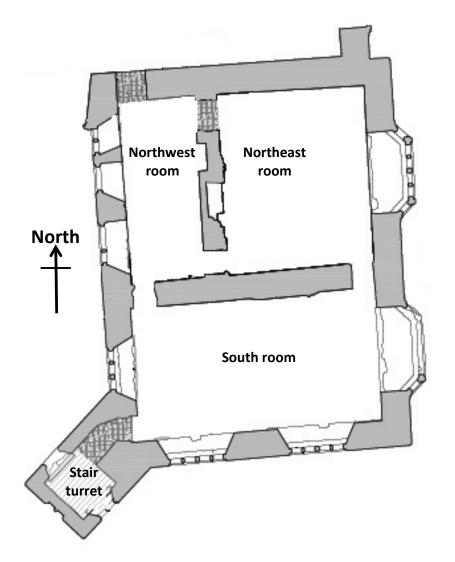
Basic plan of Leicester's Building at ground-floor level to show layout and arrangements of the rooms (after Purcell Miller Tritton)
